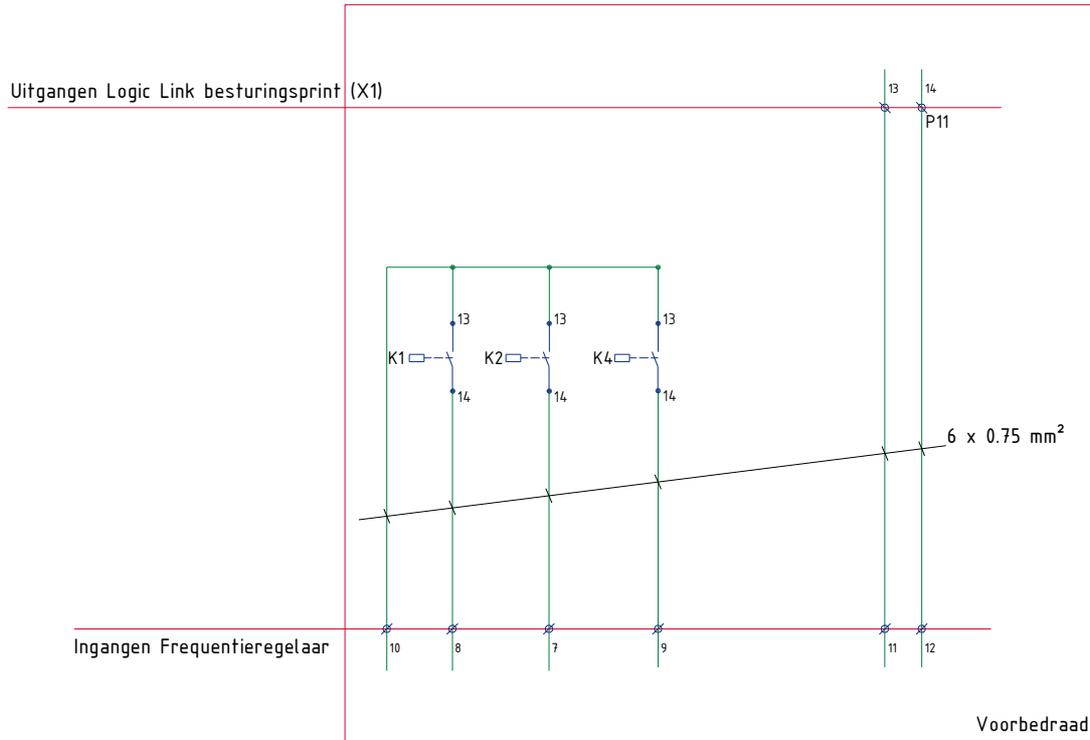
X1 (Control PCB (printed circuit board), with external connections for RLL660/661/670/671-IN)
